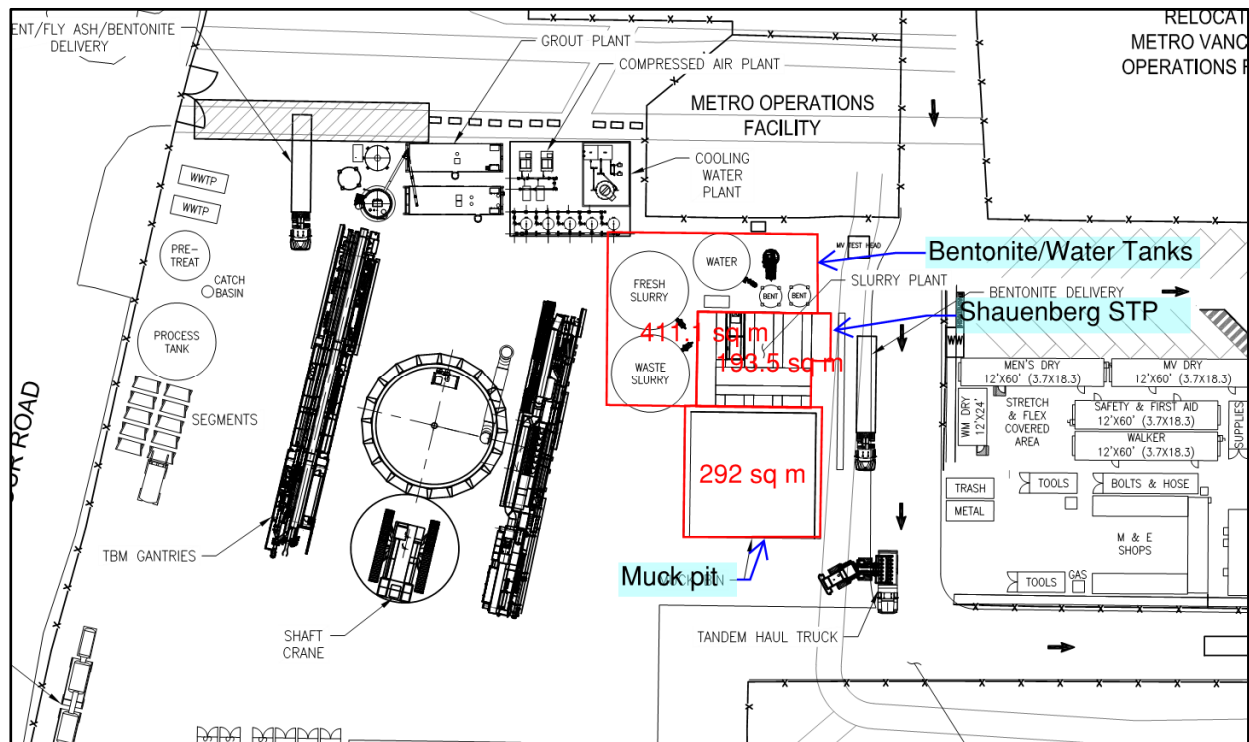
Slurry Treatment Plant Site Layout Second Narrows
